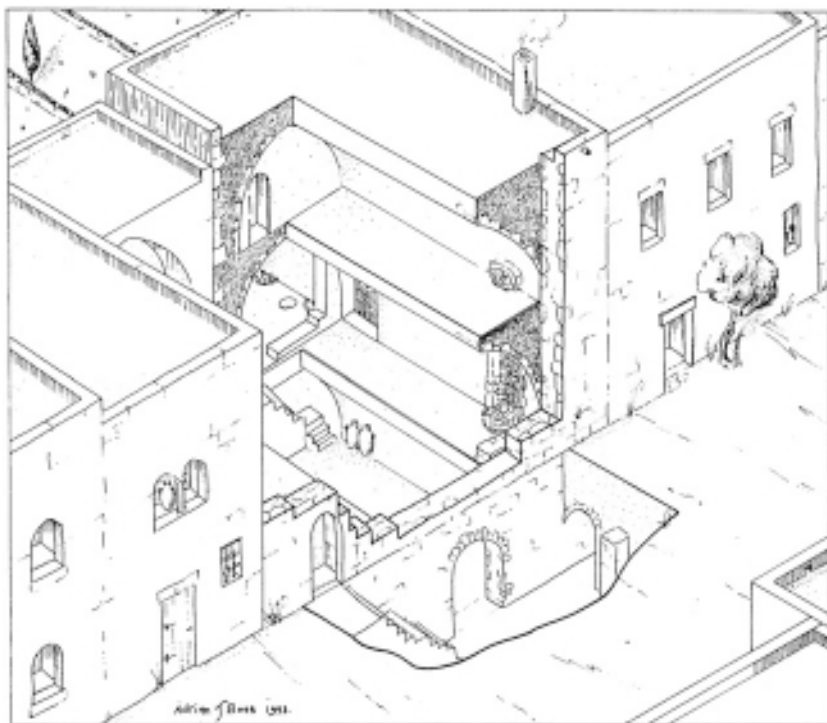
Reconstruction of house in village of al-Kurum (drawing by author).
